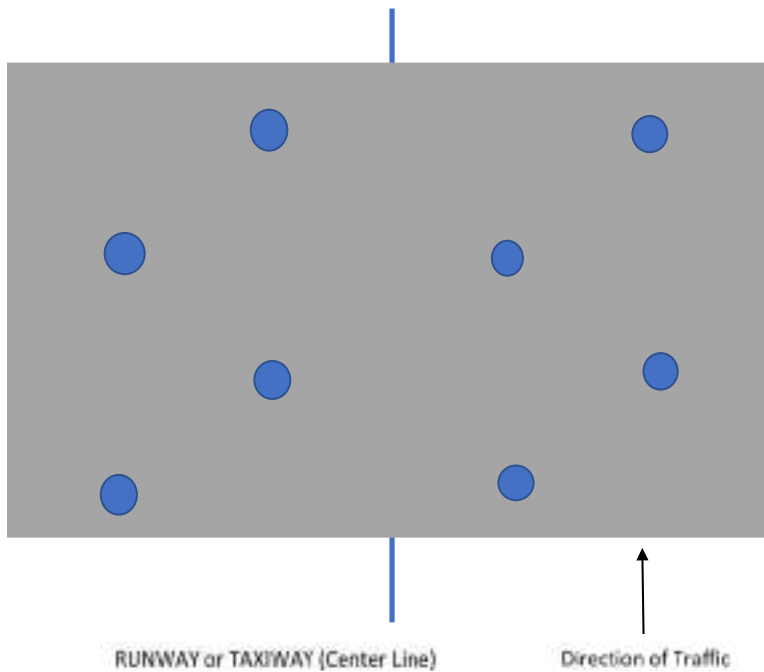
Testing Points Layout for HMA Pavement (with 10 feet and 20 feet Offset Right or Left)
